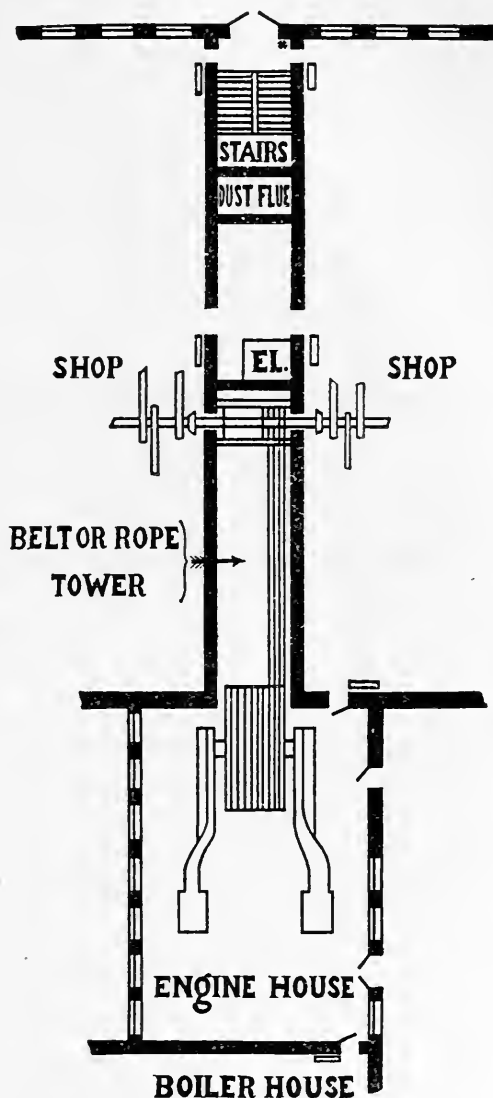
An arrangement of beltway, elevator, and stairway recommended by the Boston Manufacturers' Mutual Fire Insurance Co.
